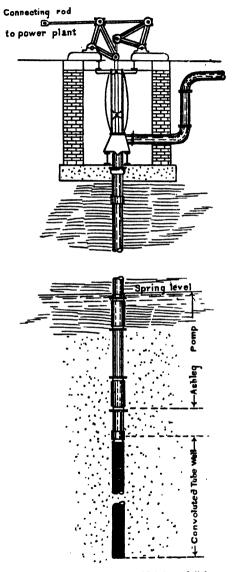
Double-acting Ashley pump with bell crank links to rods.
